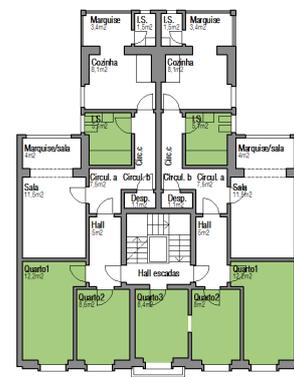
Private area consisting of two bedrooms with door/window openings onto the main façade and one bathroom near the service area.
